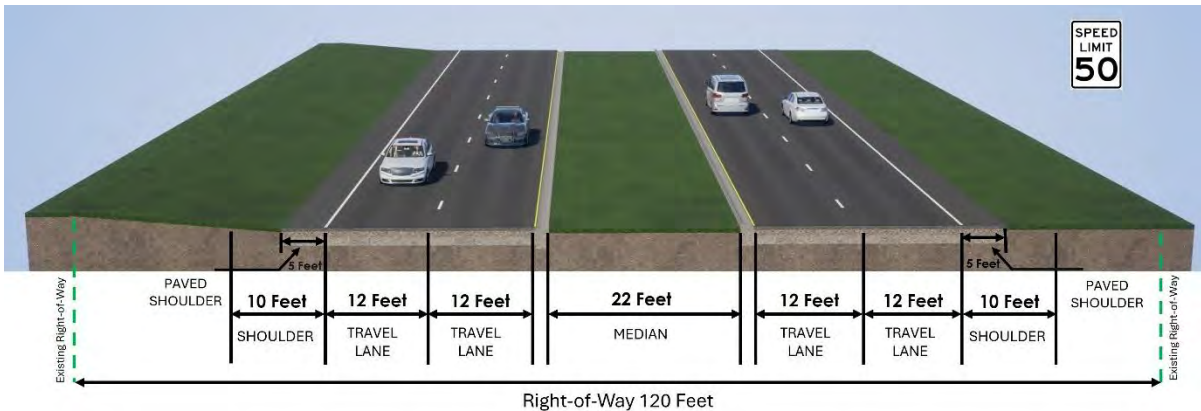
Existing Roadway Typical Section: North of DeSoto Bridge
